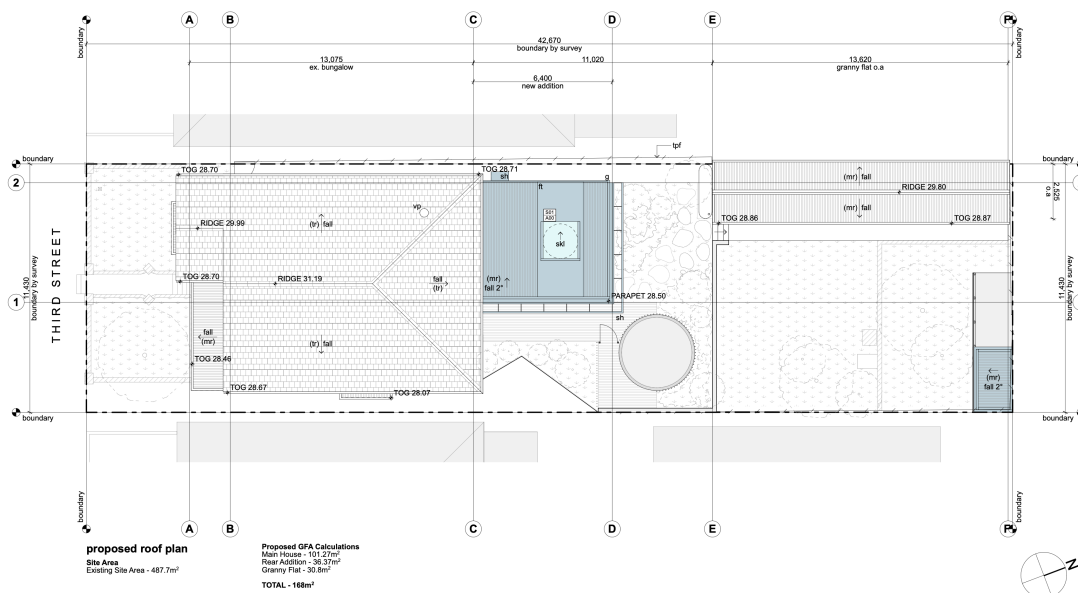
Proposed Roof Plan (Source: SWAD) - Not to Scale
